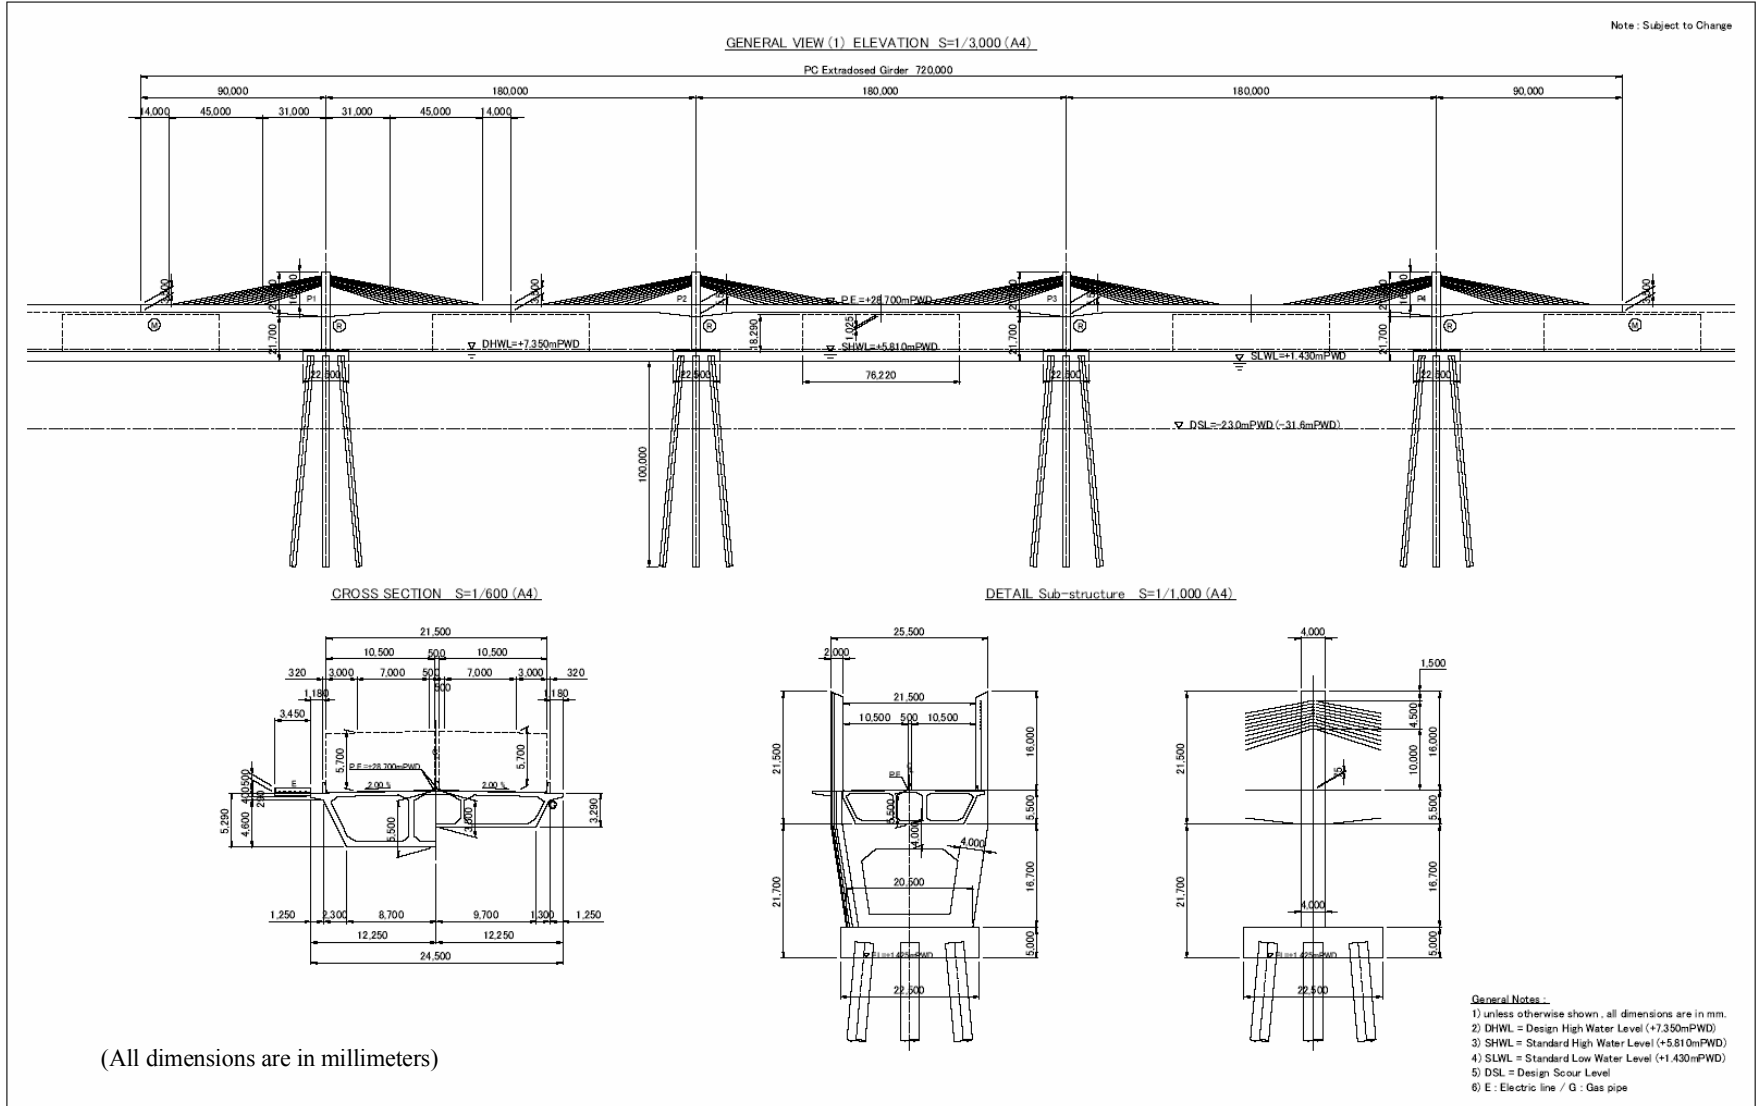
General View of Viaduct and Standard Bridge Portion (Alternative-H1)
